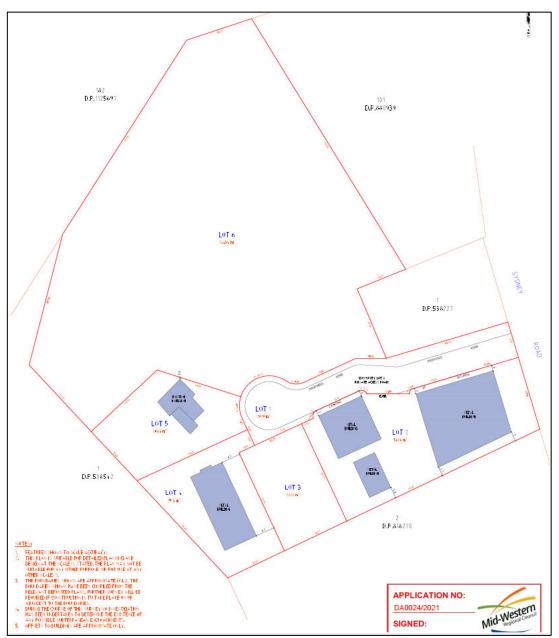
Stamped Approved Stage 1 CT Subdivision Plan for DA0024/2021
